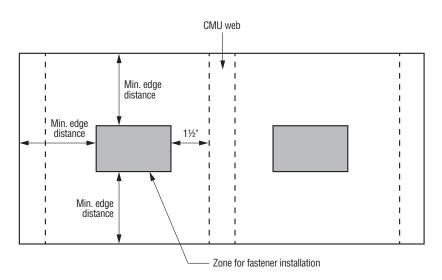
Zone for Fastener Installation in Face Shell of CMU
